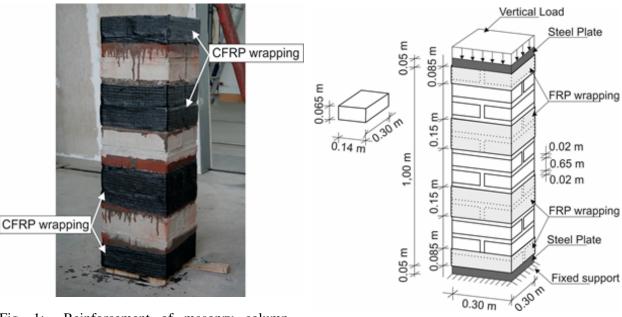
Reinforcement of masonry column by CFRP wrapping.
